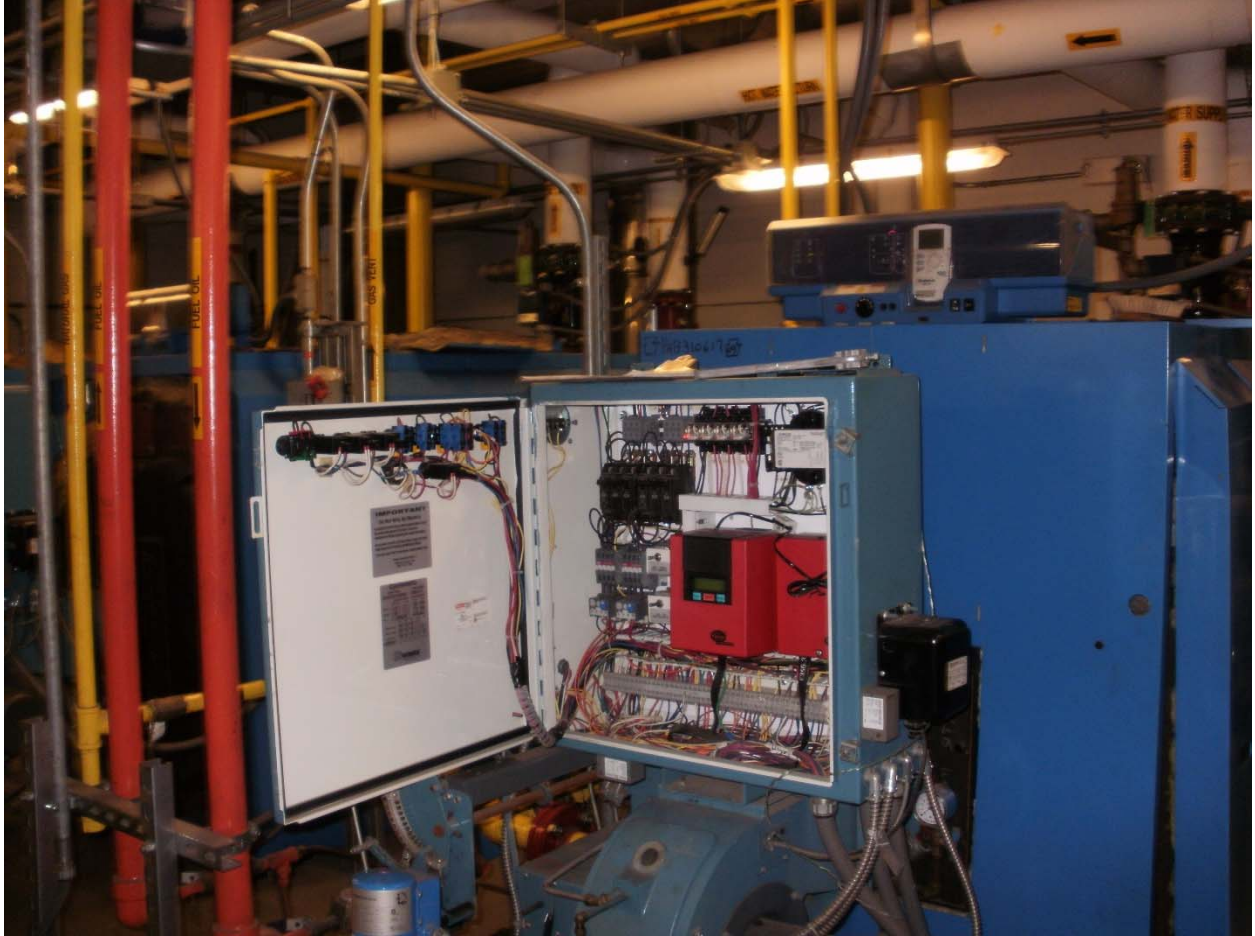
New Webster Boiler No.2 installed @ 2010 located in the Boiler Room
